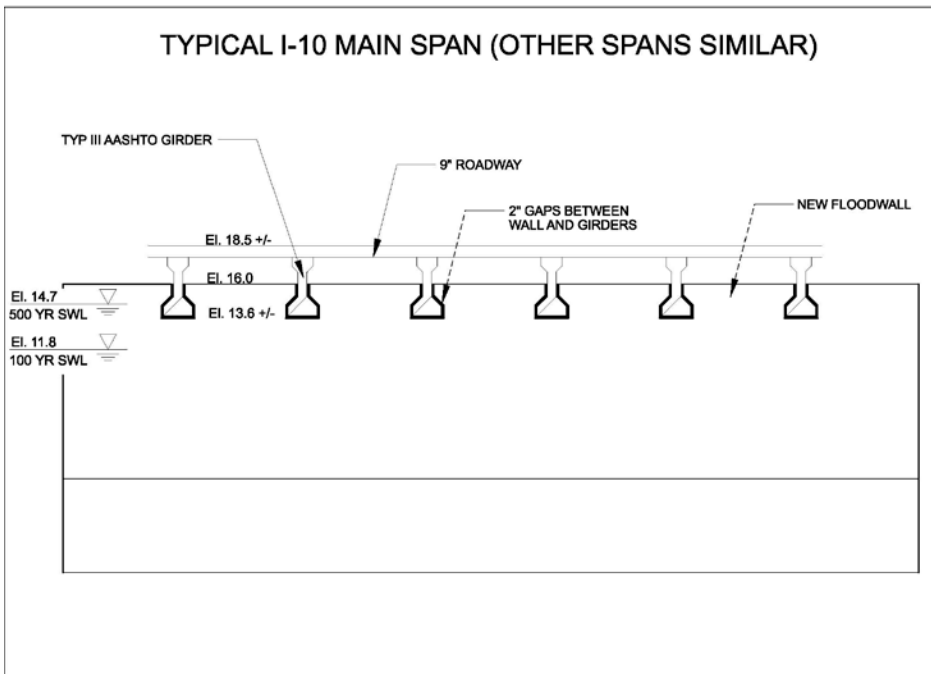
I-10 Span and Floodwall Design. 1% chance exceedence and proposed floodwall design heights are shown along with the 1% and 0.2% chance exceedence SWE.
